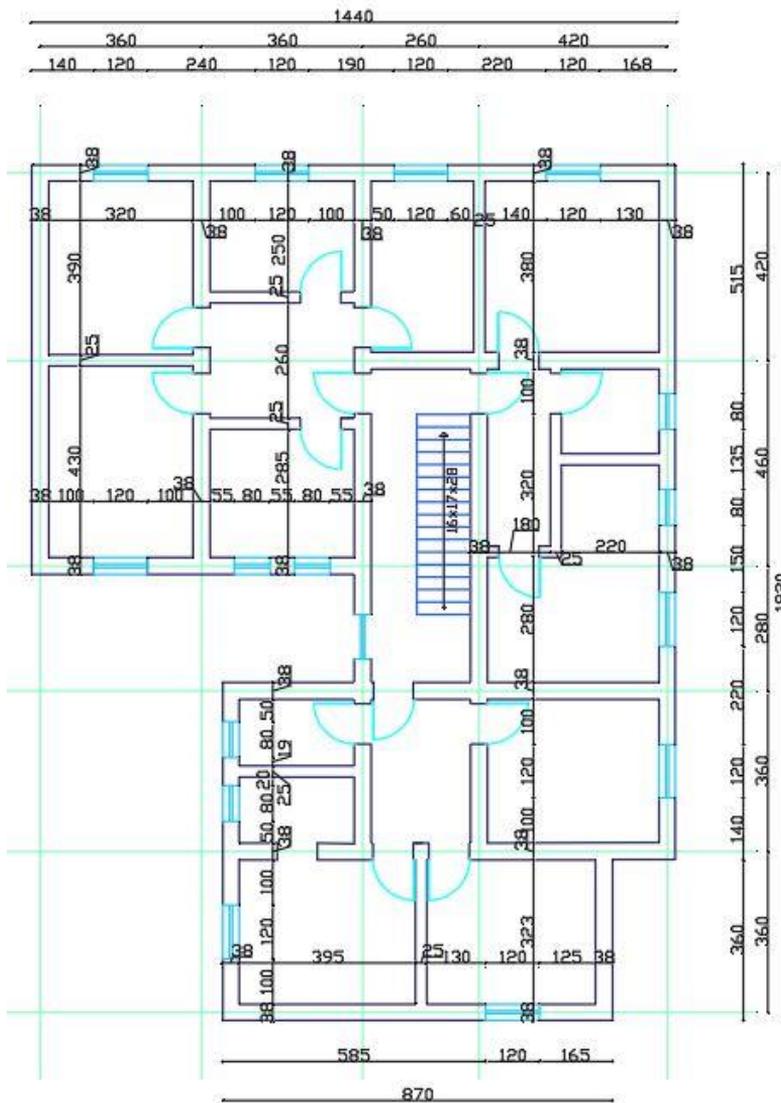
Typical plan view of the selected masonry building, (units in cm)
